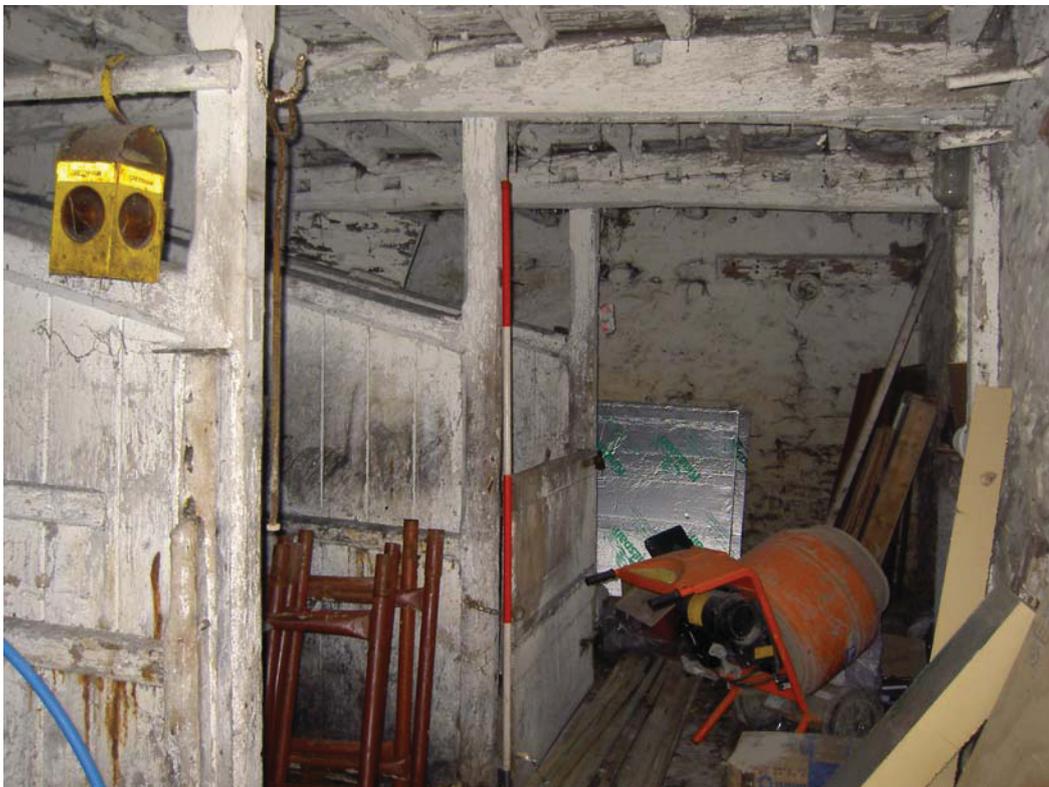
Stalls in eastern shippon, lower ground floor of Building 4
